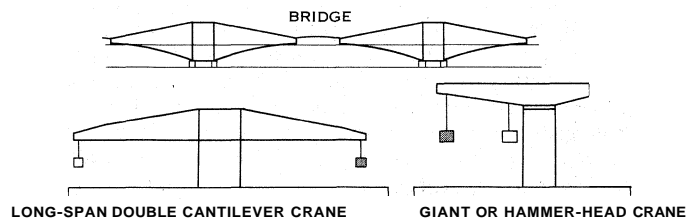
THE CANTILEVER IN BRIDGE BUILDING AND IN CRANES
